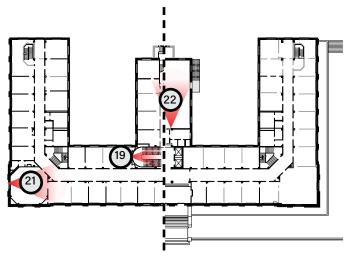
Key plan of the second (left) and first (right) floor of the FRB-East Building.
